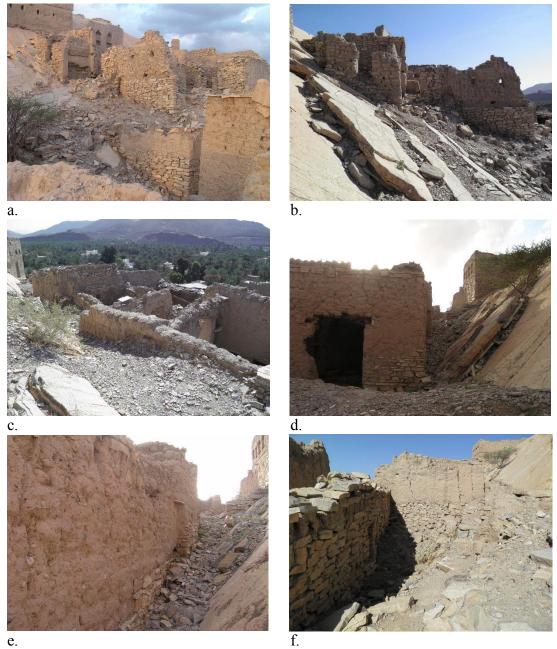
The stone foundation and construction technique (phase-3): a. the combined technique using the natural steep stone surface structure as a preliminary anchoring foundation at the upper level for and terrace foundations at the lower levels, b. side views of the terrace foundations, c. half berried foundation wall from the back side of the dwellings, d. the development from half berried to terrace foundations, c. clear view showing the development of the technique, f. combination of the three techniques in the upper communal male meeting hall.
